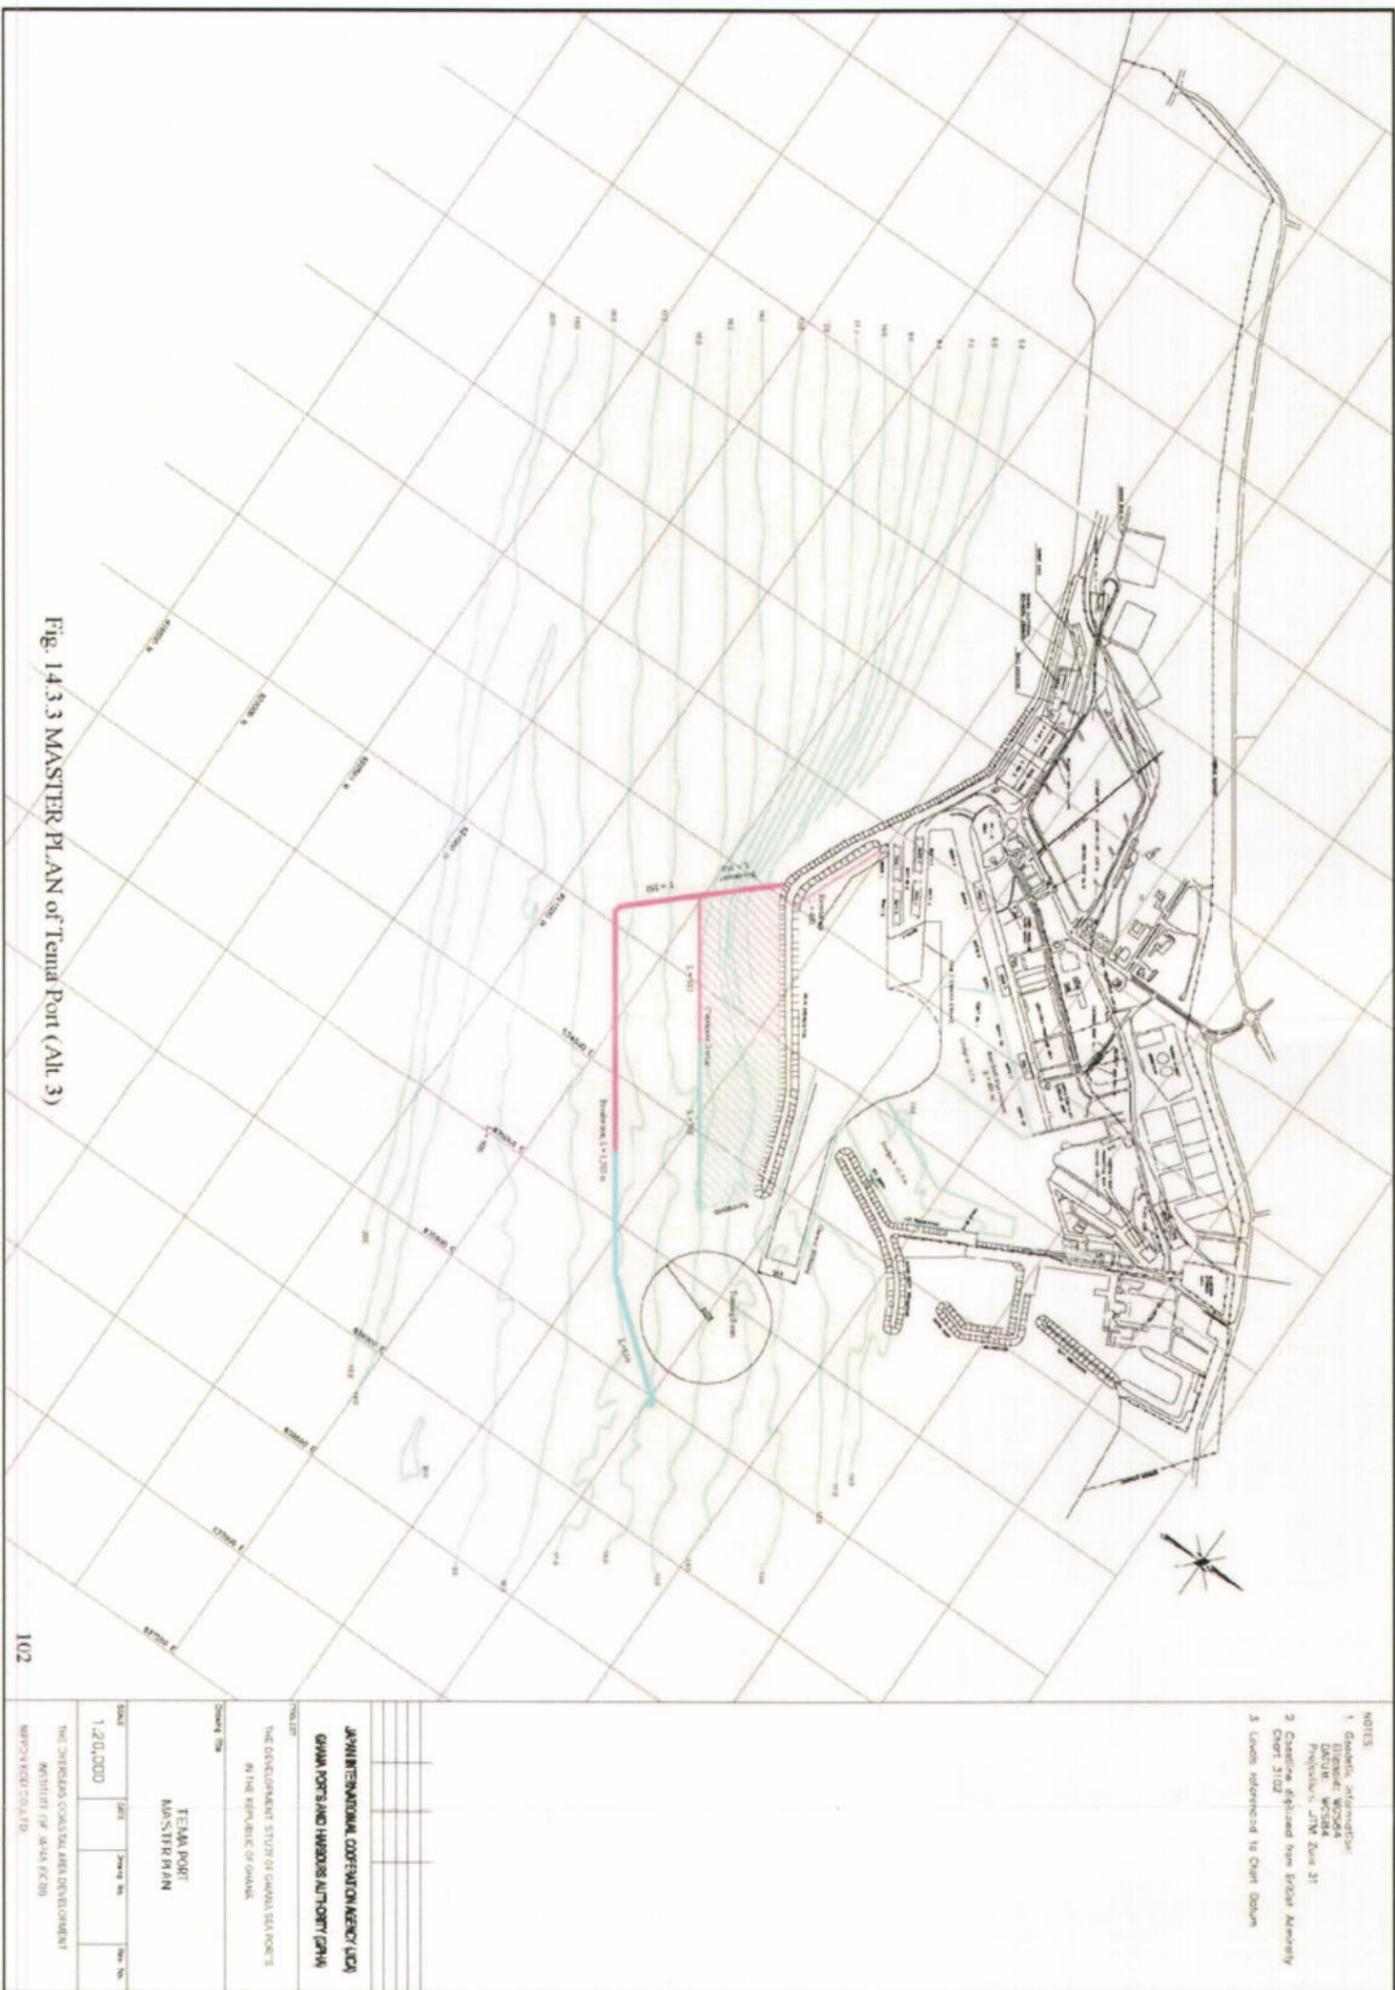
MASTER PLAN of Tema Port (Alt. 3)
